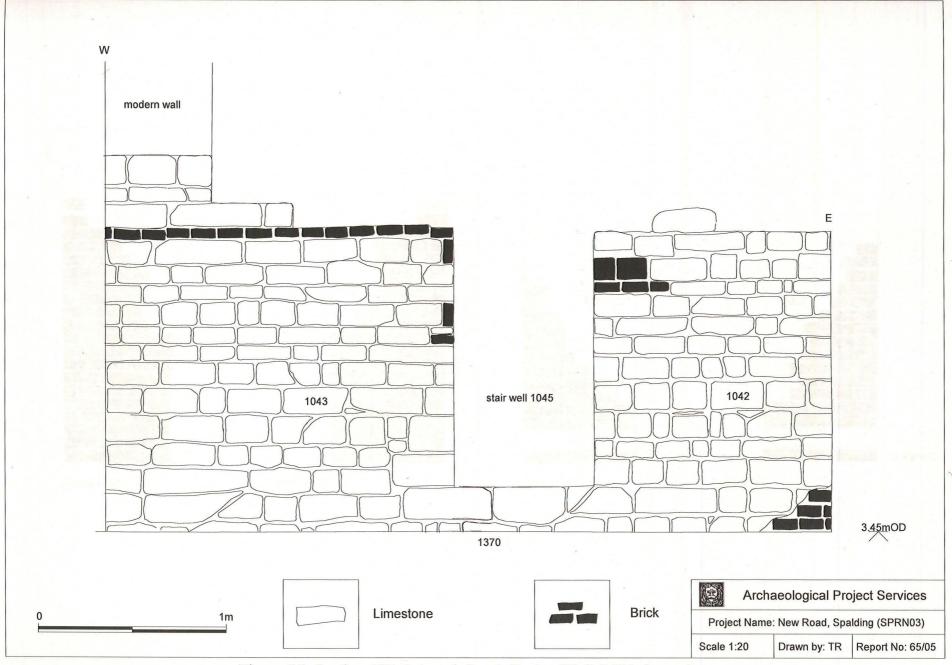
Section 197, Internal South Facing Wall Of Undercroft
